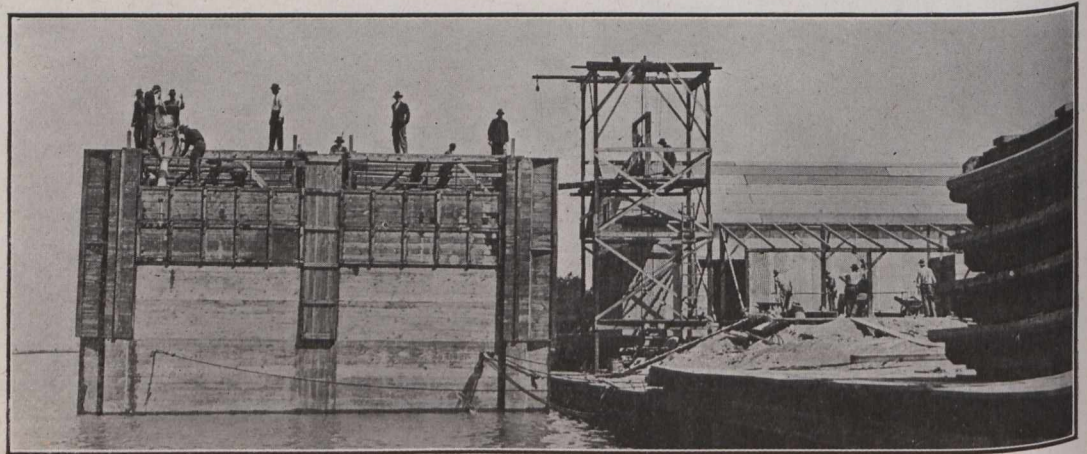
View Showing Method of Placing Concrete. It is elevated in barrows and transported over various runways to different parts of the crib. A pile of completed wooden bottoms is shown at extreme right.
